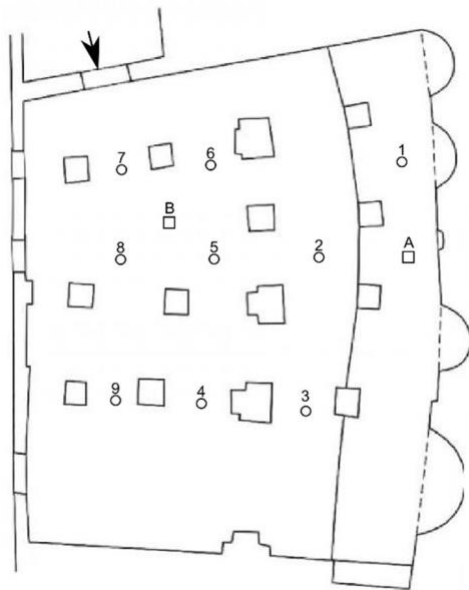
Plan of the church with location of source (A,B) and receiver (1-9) positions
